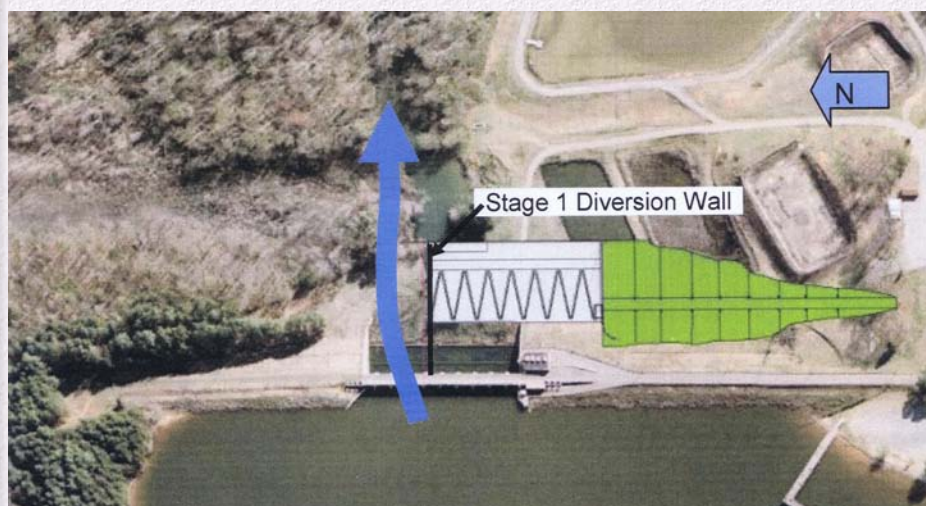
Stage 1 Diversion, showing flow path and location of diversion wall
